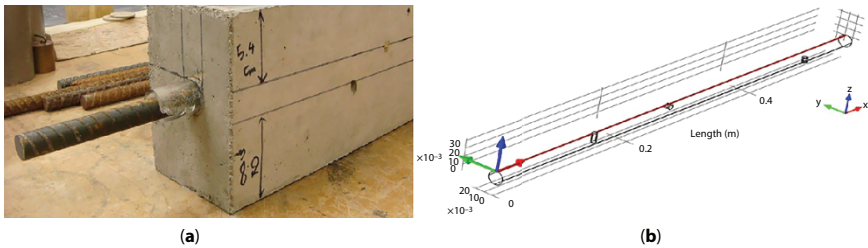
(a) Concrete beam specimen. (b) Three small holes in sound steel reinforcement (rebar).
